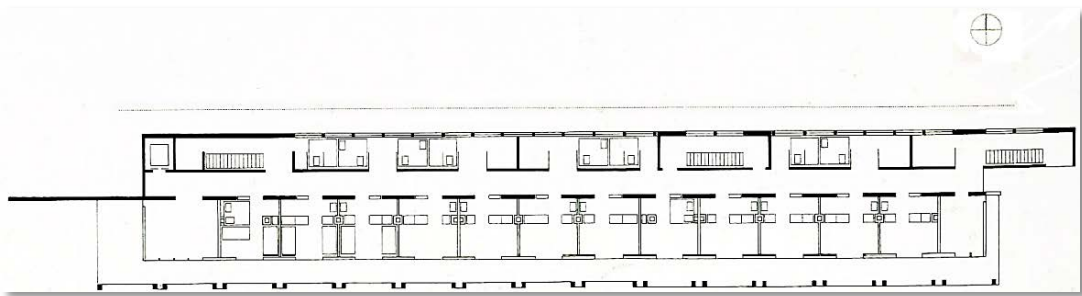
Guest Building, Windberg, Lower Ground floor plan
